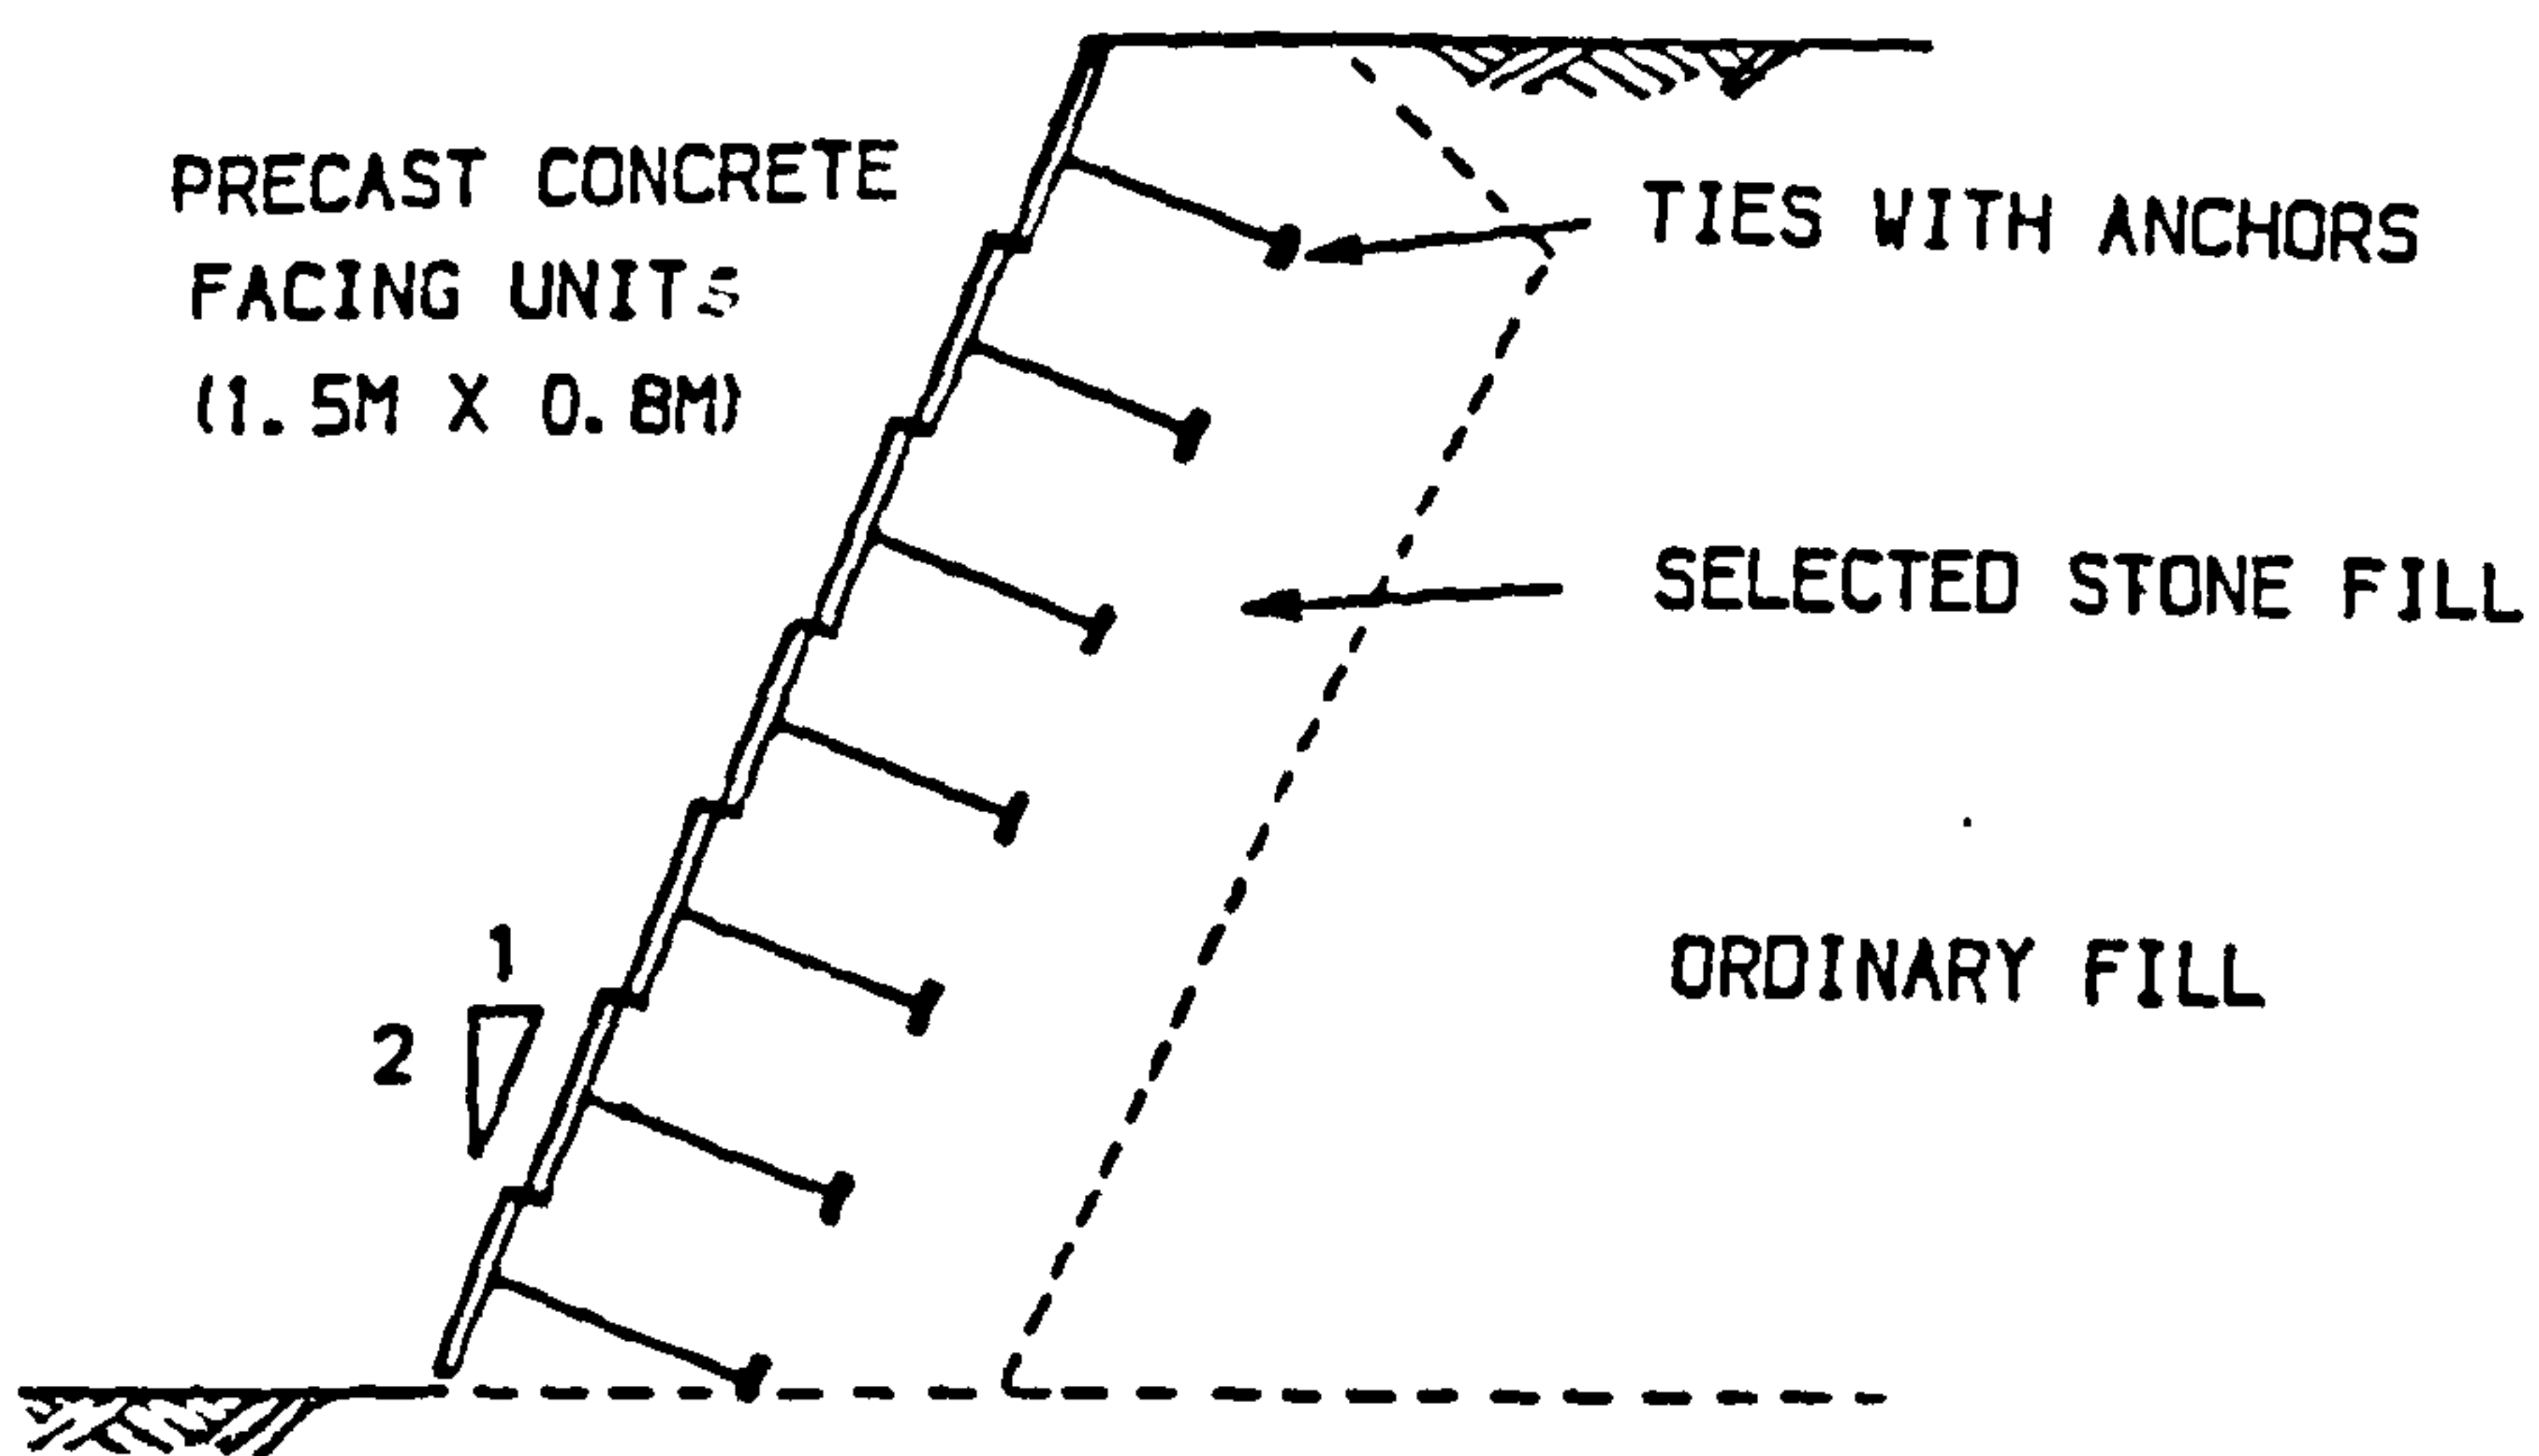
LADDER WALL (AFTER COYNE, 1928).
